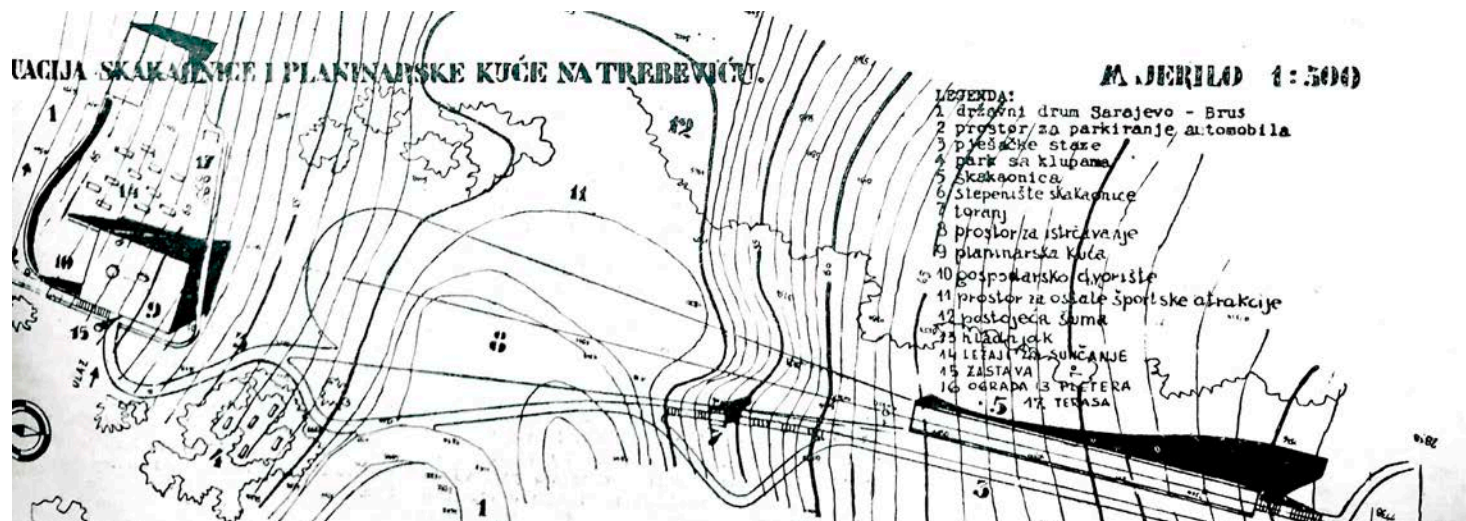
J. Neidhardt. Trebević ski chalet floor plan
